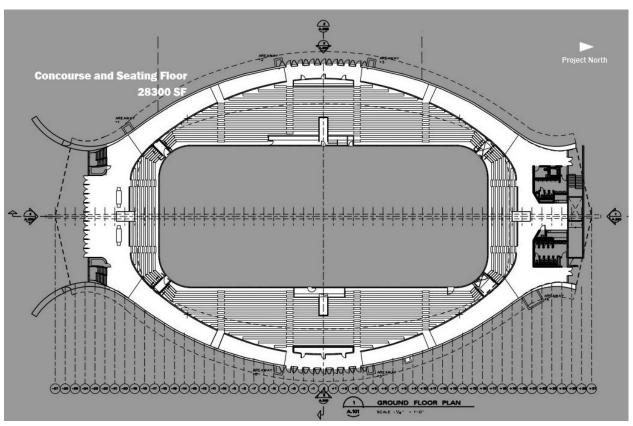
| Ground Floor Plan – Concourse and Seating Floor
